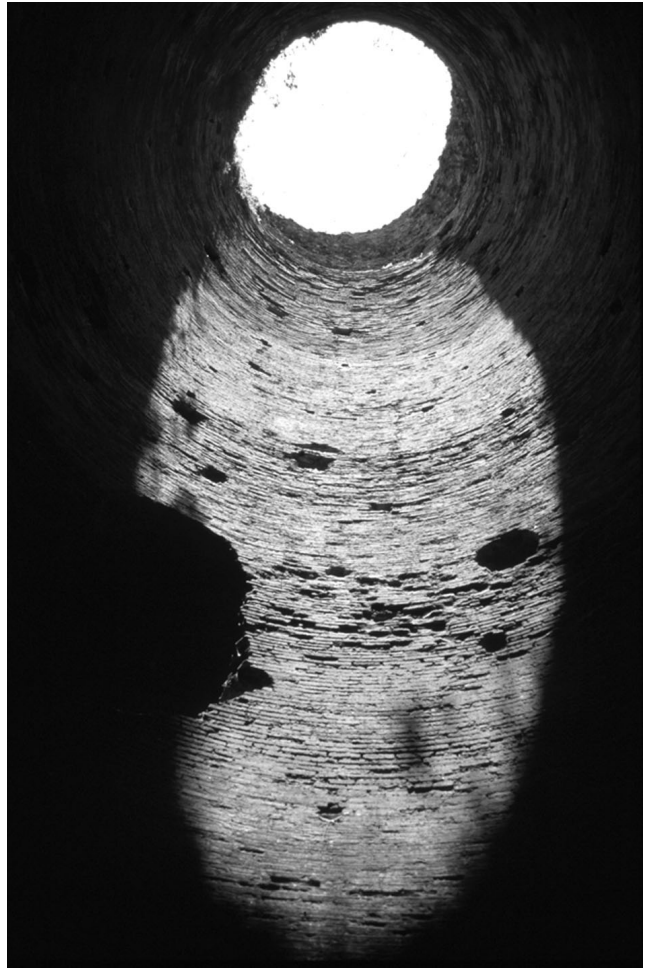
The interior walls of the tomb of Caecilia Metella are lined with bricks made of roof tiles (photo Niklas Hillbom)
